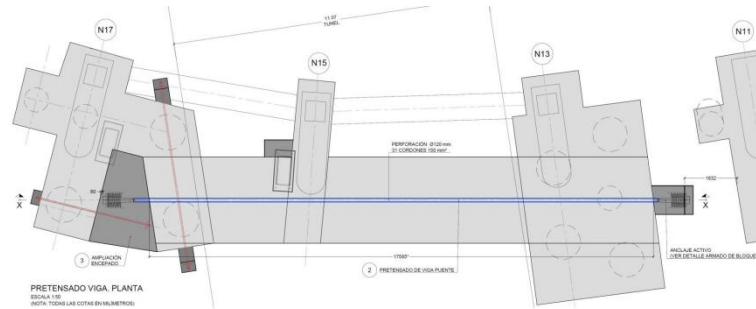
Plan view of one of the structures over the tunnel showing the successive interventions of 1947, 1994, and the current reinforcement. The new roof supports are located next to ribs N15 and N17
